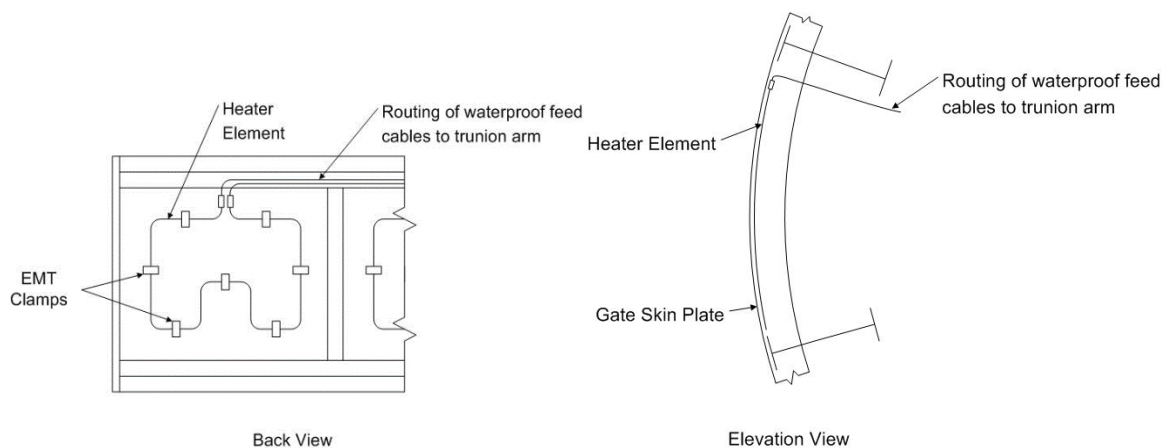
Two skin plate heater designs. Heater elements attached to the downstream side of the skin plate using EMT clamps.
